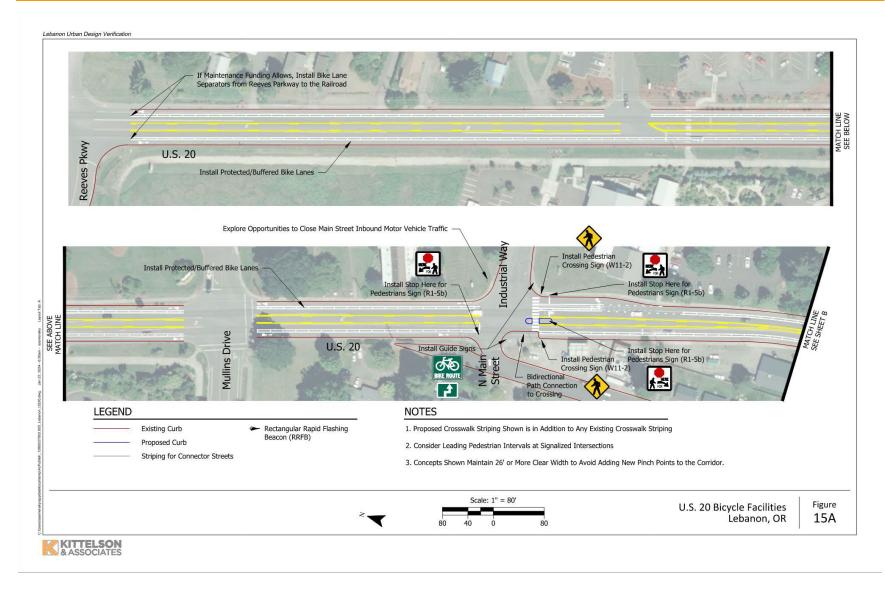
A: U.S. 20 Bicycle Facilities Sheet A
